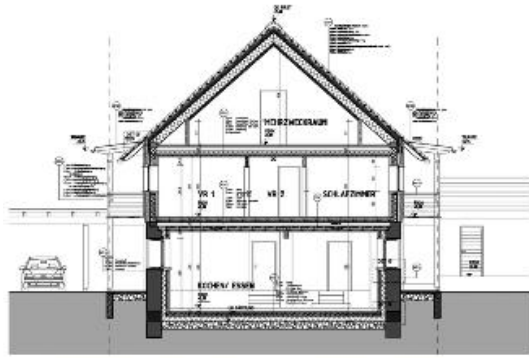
Cross section. Internal insulation on the ground floor and in the column free passive house loft.
